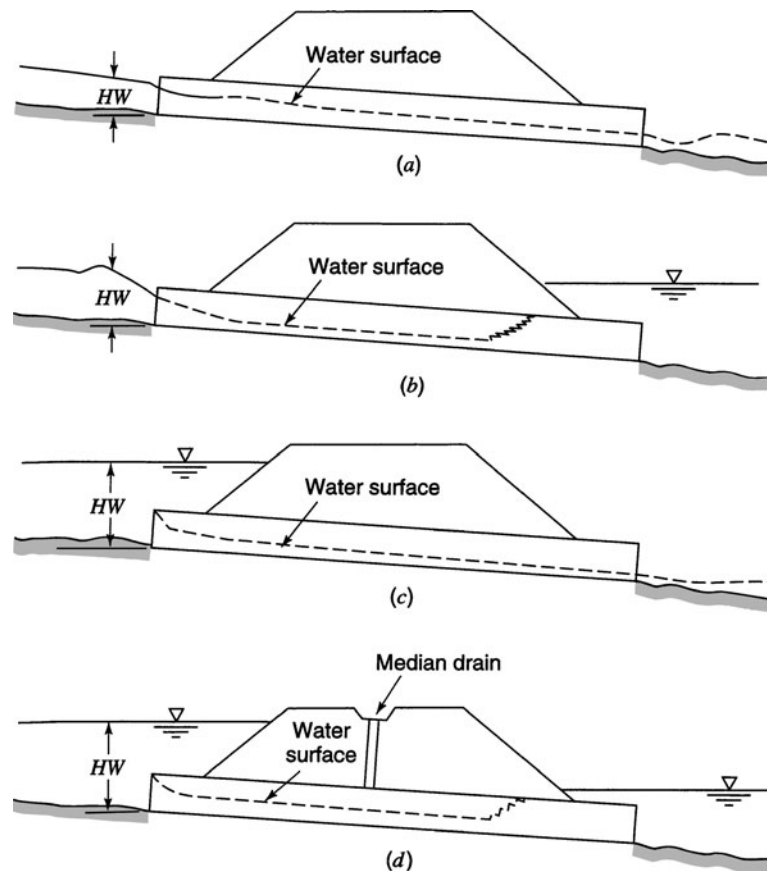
Types of inlet control. (a) Outlet and inlet unsubmerged; (b) Outlet submerged, inlet unsubmerged; (c) Inlet submerged and outlet unsubmerged; (d) Outlet and inlet submerged (from Normann et al. (1985)).
